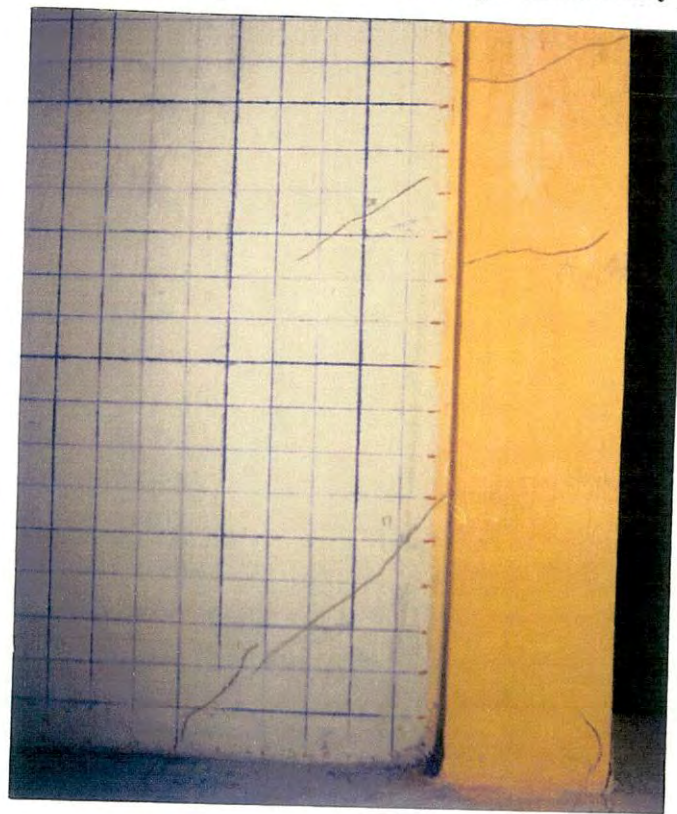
Complete diagonal failure of the original frame at a load of 19 Ton.
